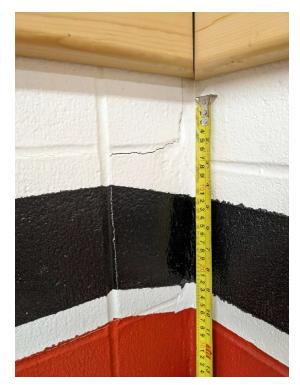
Irregular/Poor Transition in Zamboni Room Wall
